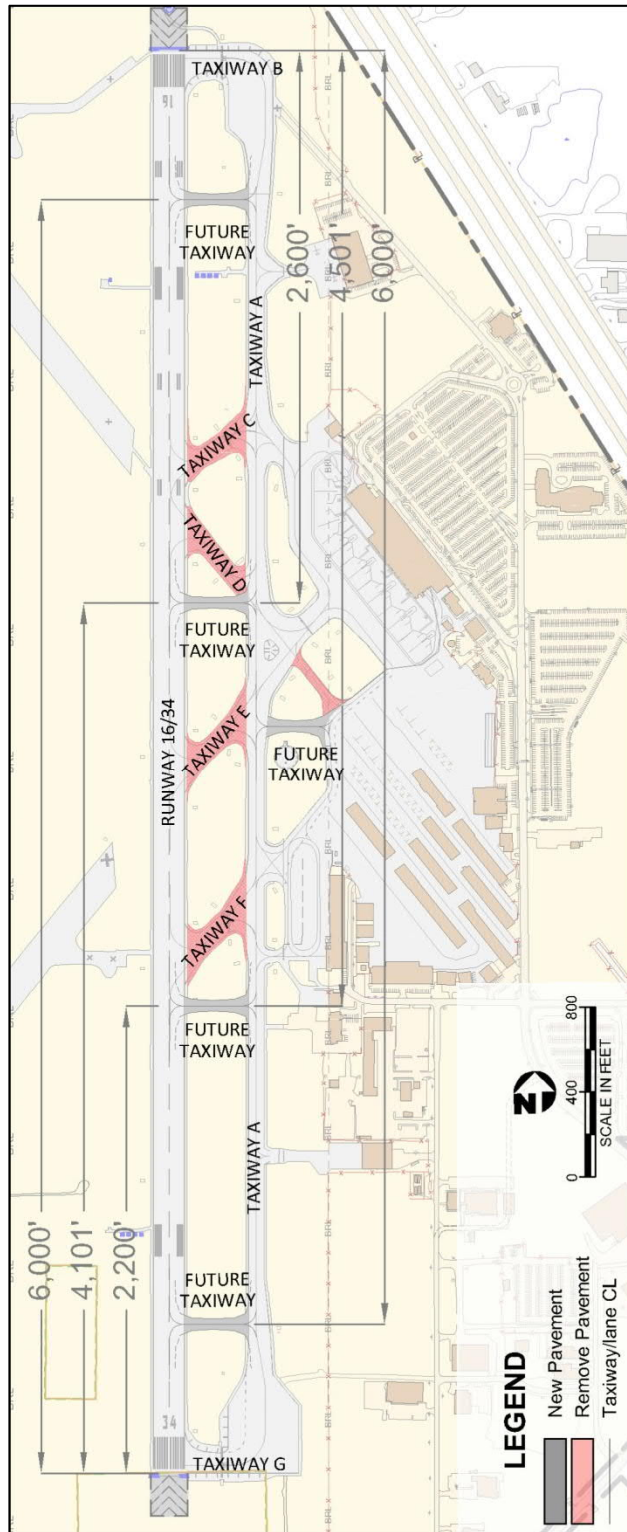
Taxiway Layout Alternative 2 - Reposition and Construct 90 Degree Exits
